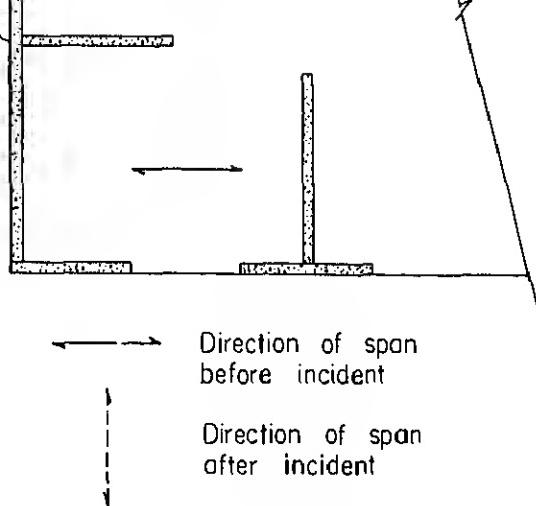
Change of Slab Span Direction Under the Effects of Abn Loadings
